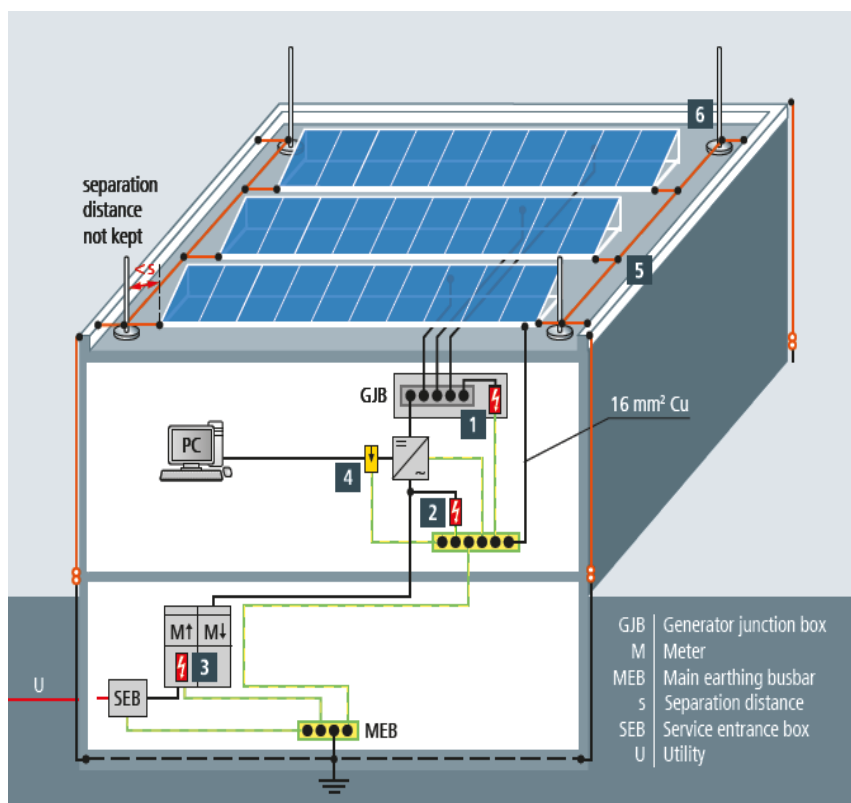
Installation of a Rooftop PV System with a LPS (Ample Roof Space)
